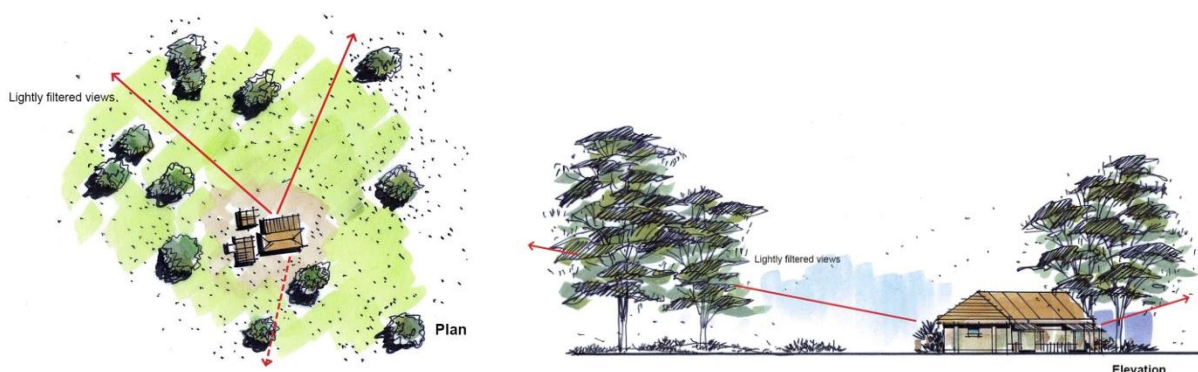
TYPOLOGY 1 – TYPICAL PLAN AND SECTION
